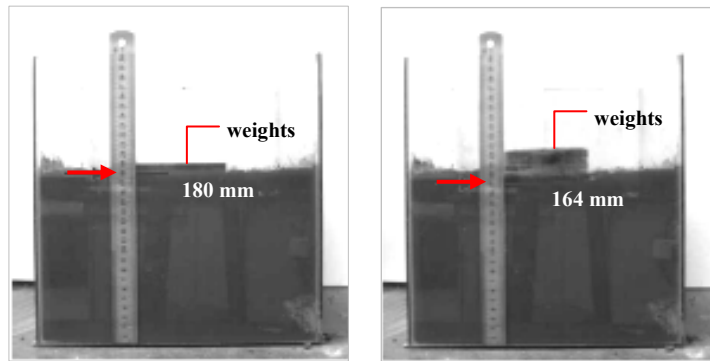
Load test of the foundation system: the arrow marker indicates the soil bed level (settlement) under different loads
